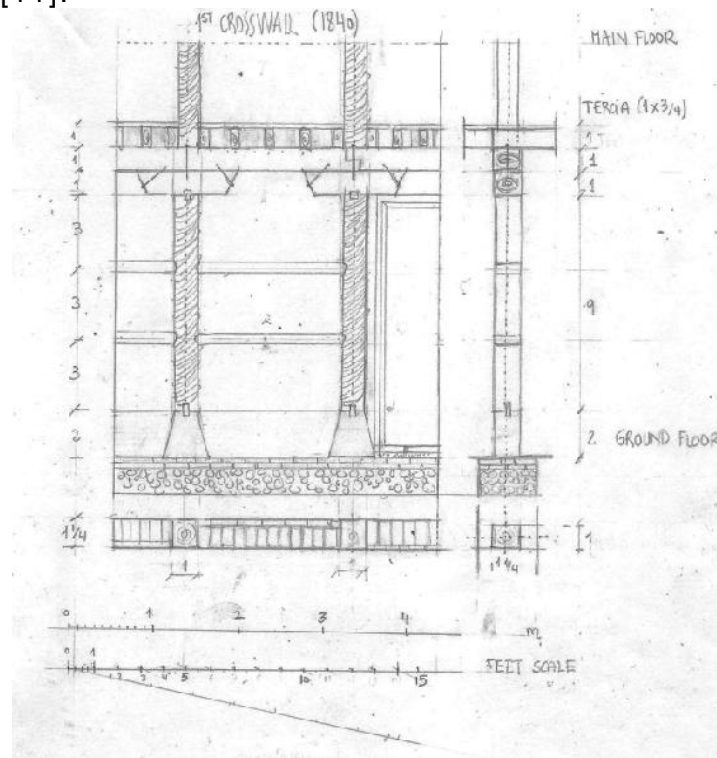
detail of a pie y cuarto timber framed wall built in the ground floor for entramado building [11]
